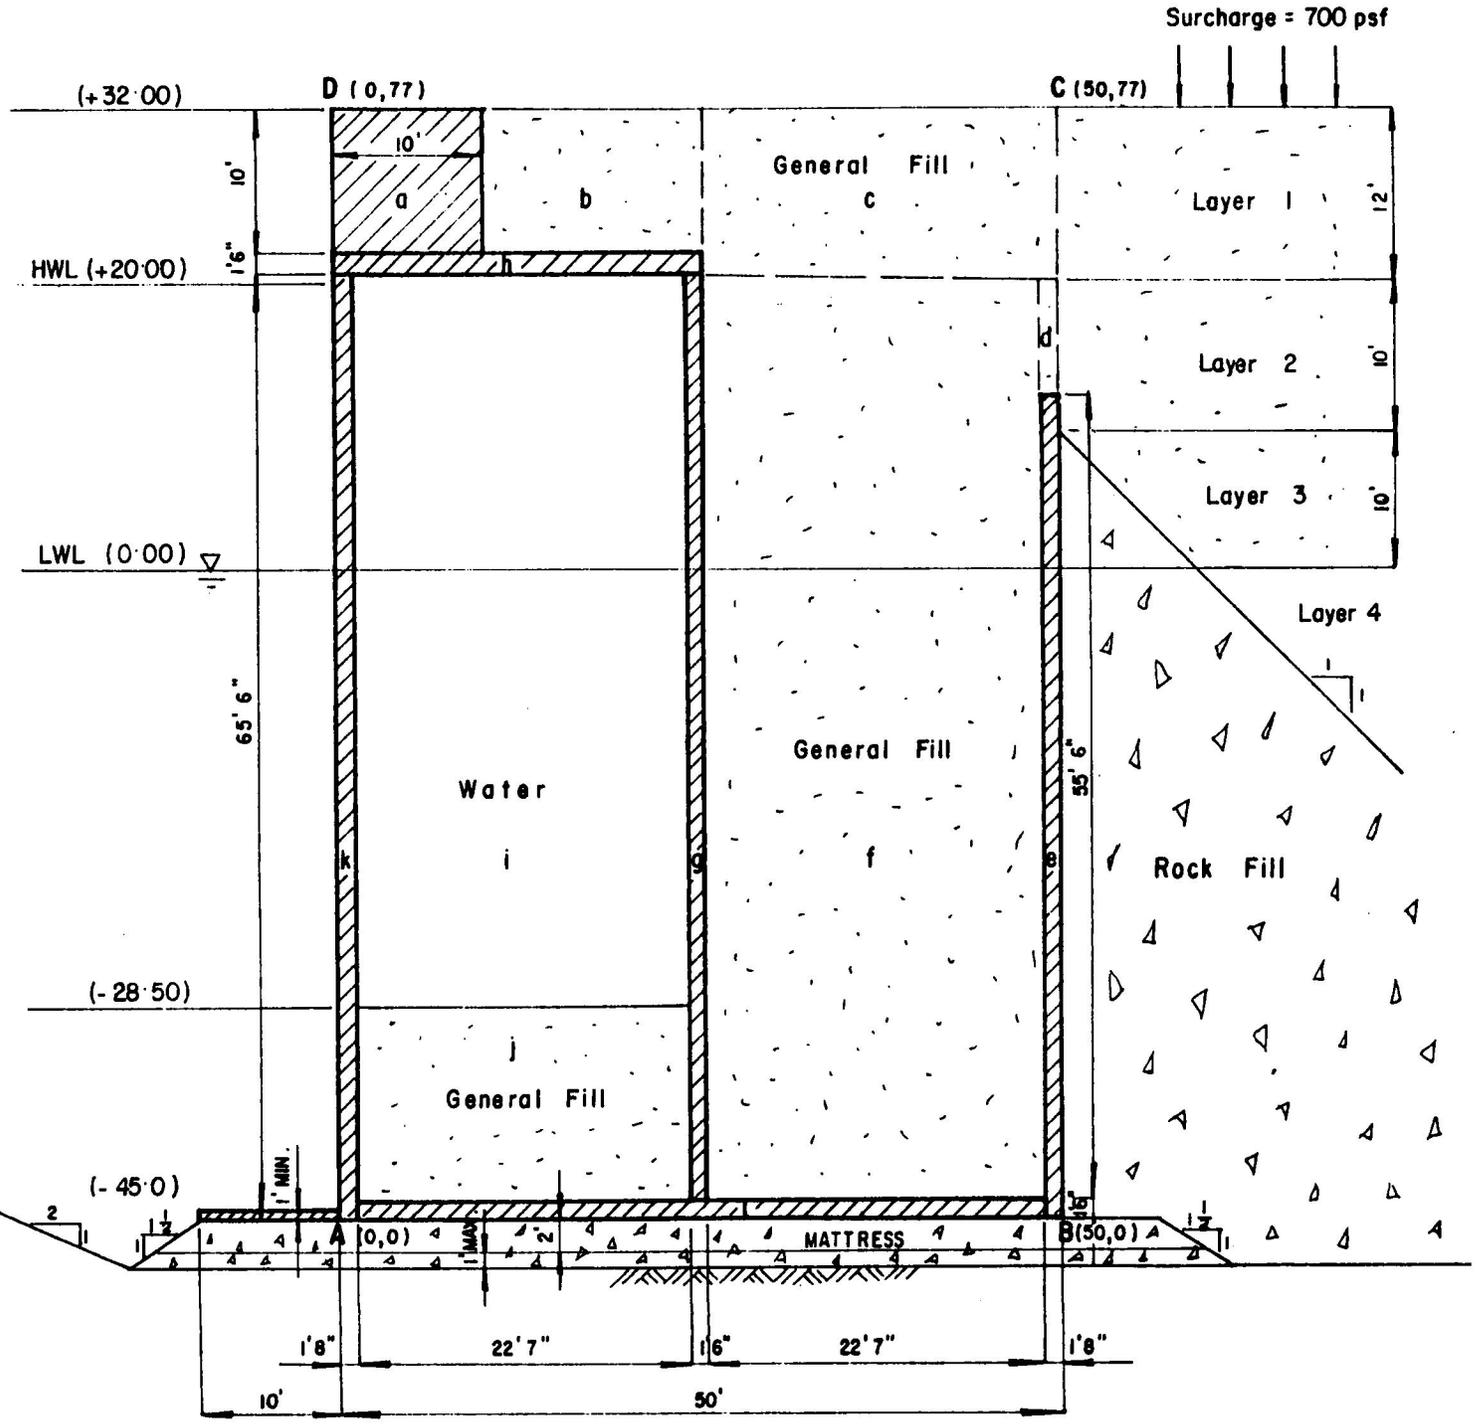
ASSUMED CROSS SECTION OF MARGINAL WHARF RETAINING WALL AND BACKFILL
